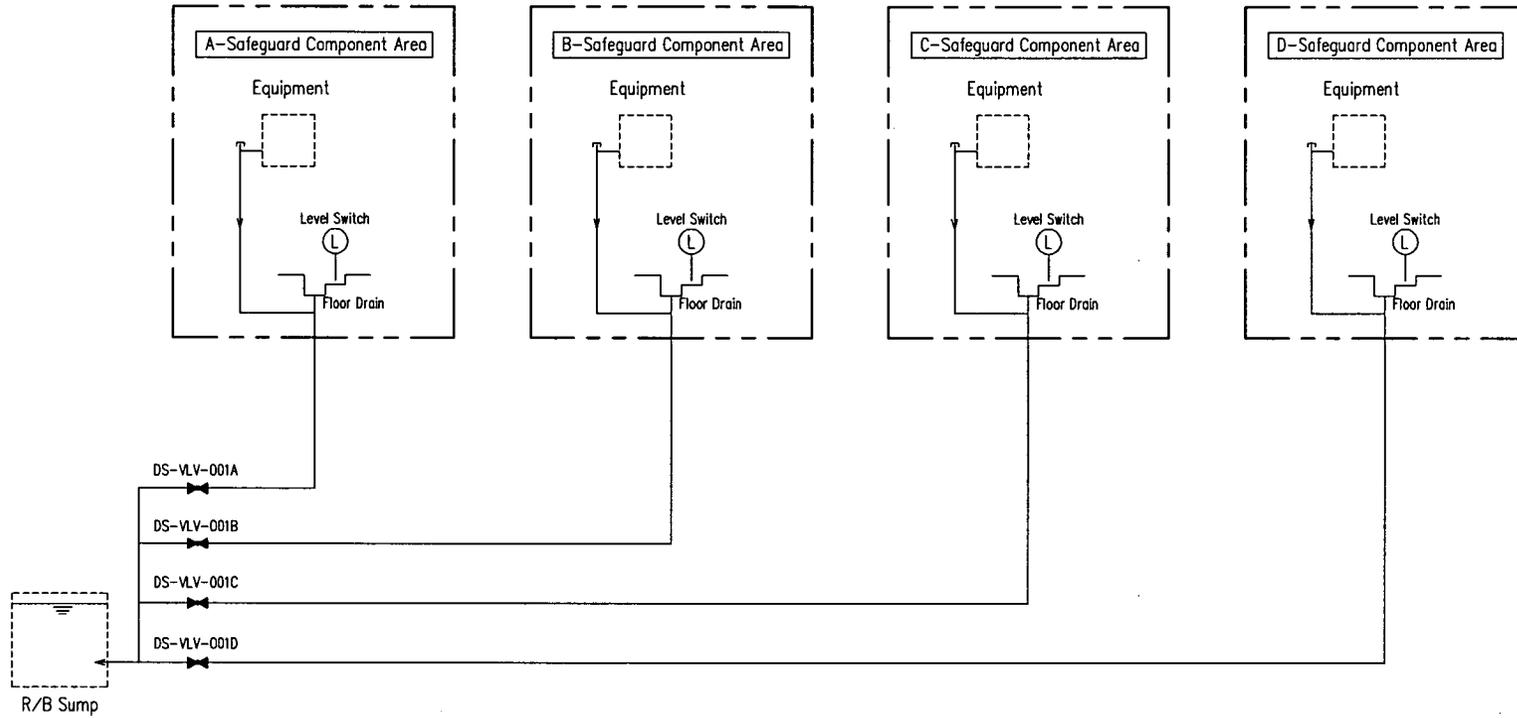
Equipment and Floor Drain System Flow Schematic
